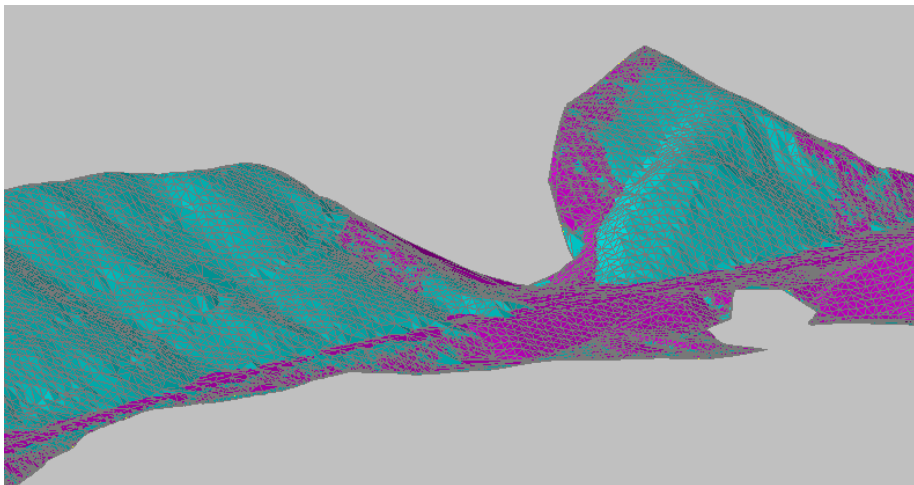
3D View of Short, Hilly Section Surfaces
